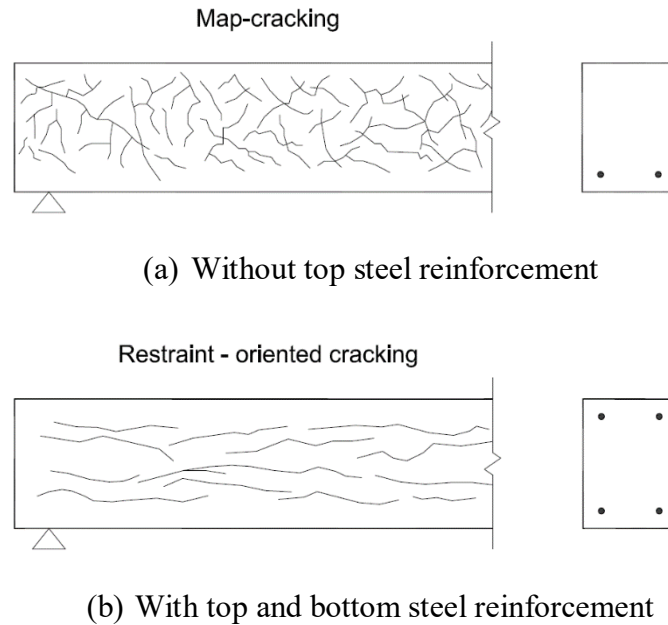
5 Cracking pattern of ASR affected reinforced concrete beam
